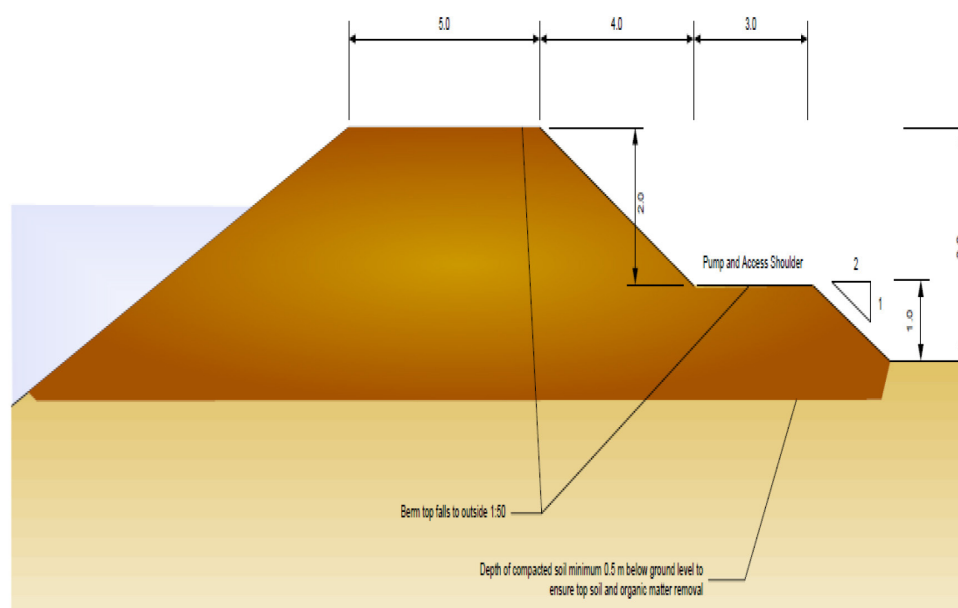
Detail of Typical Berm diagram (Source: FGV)
